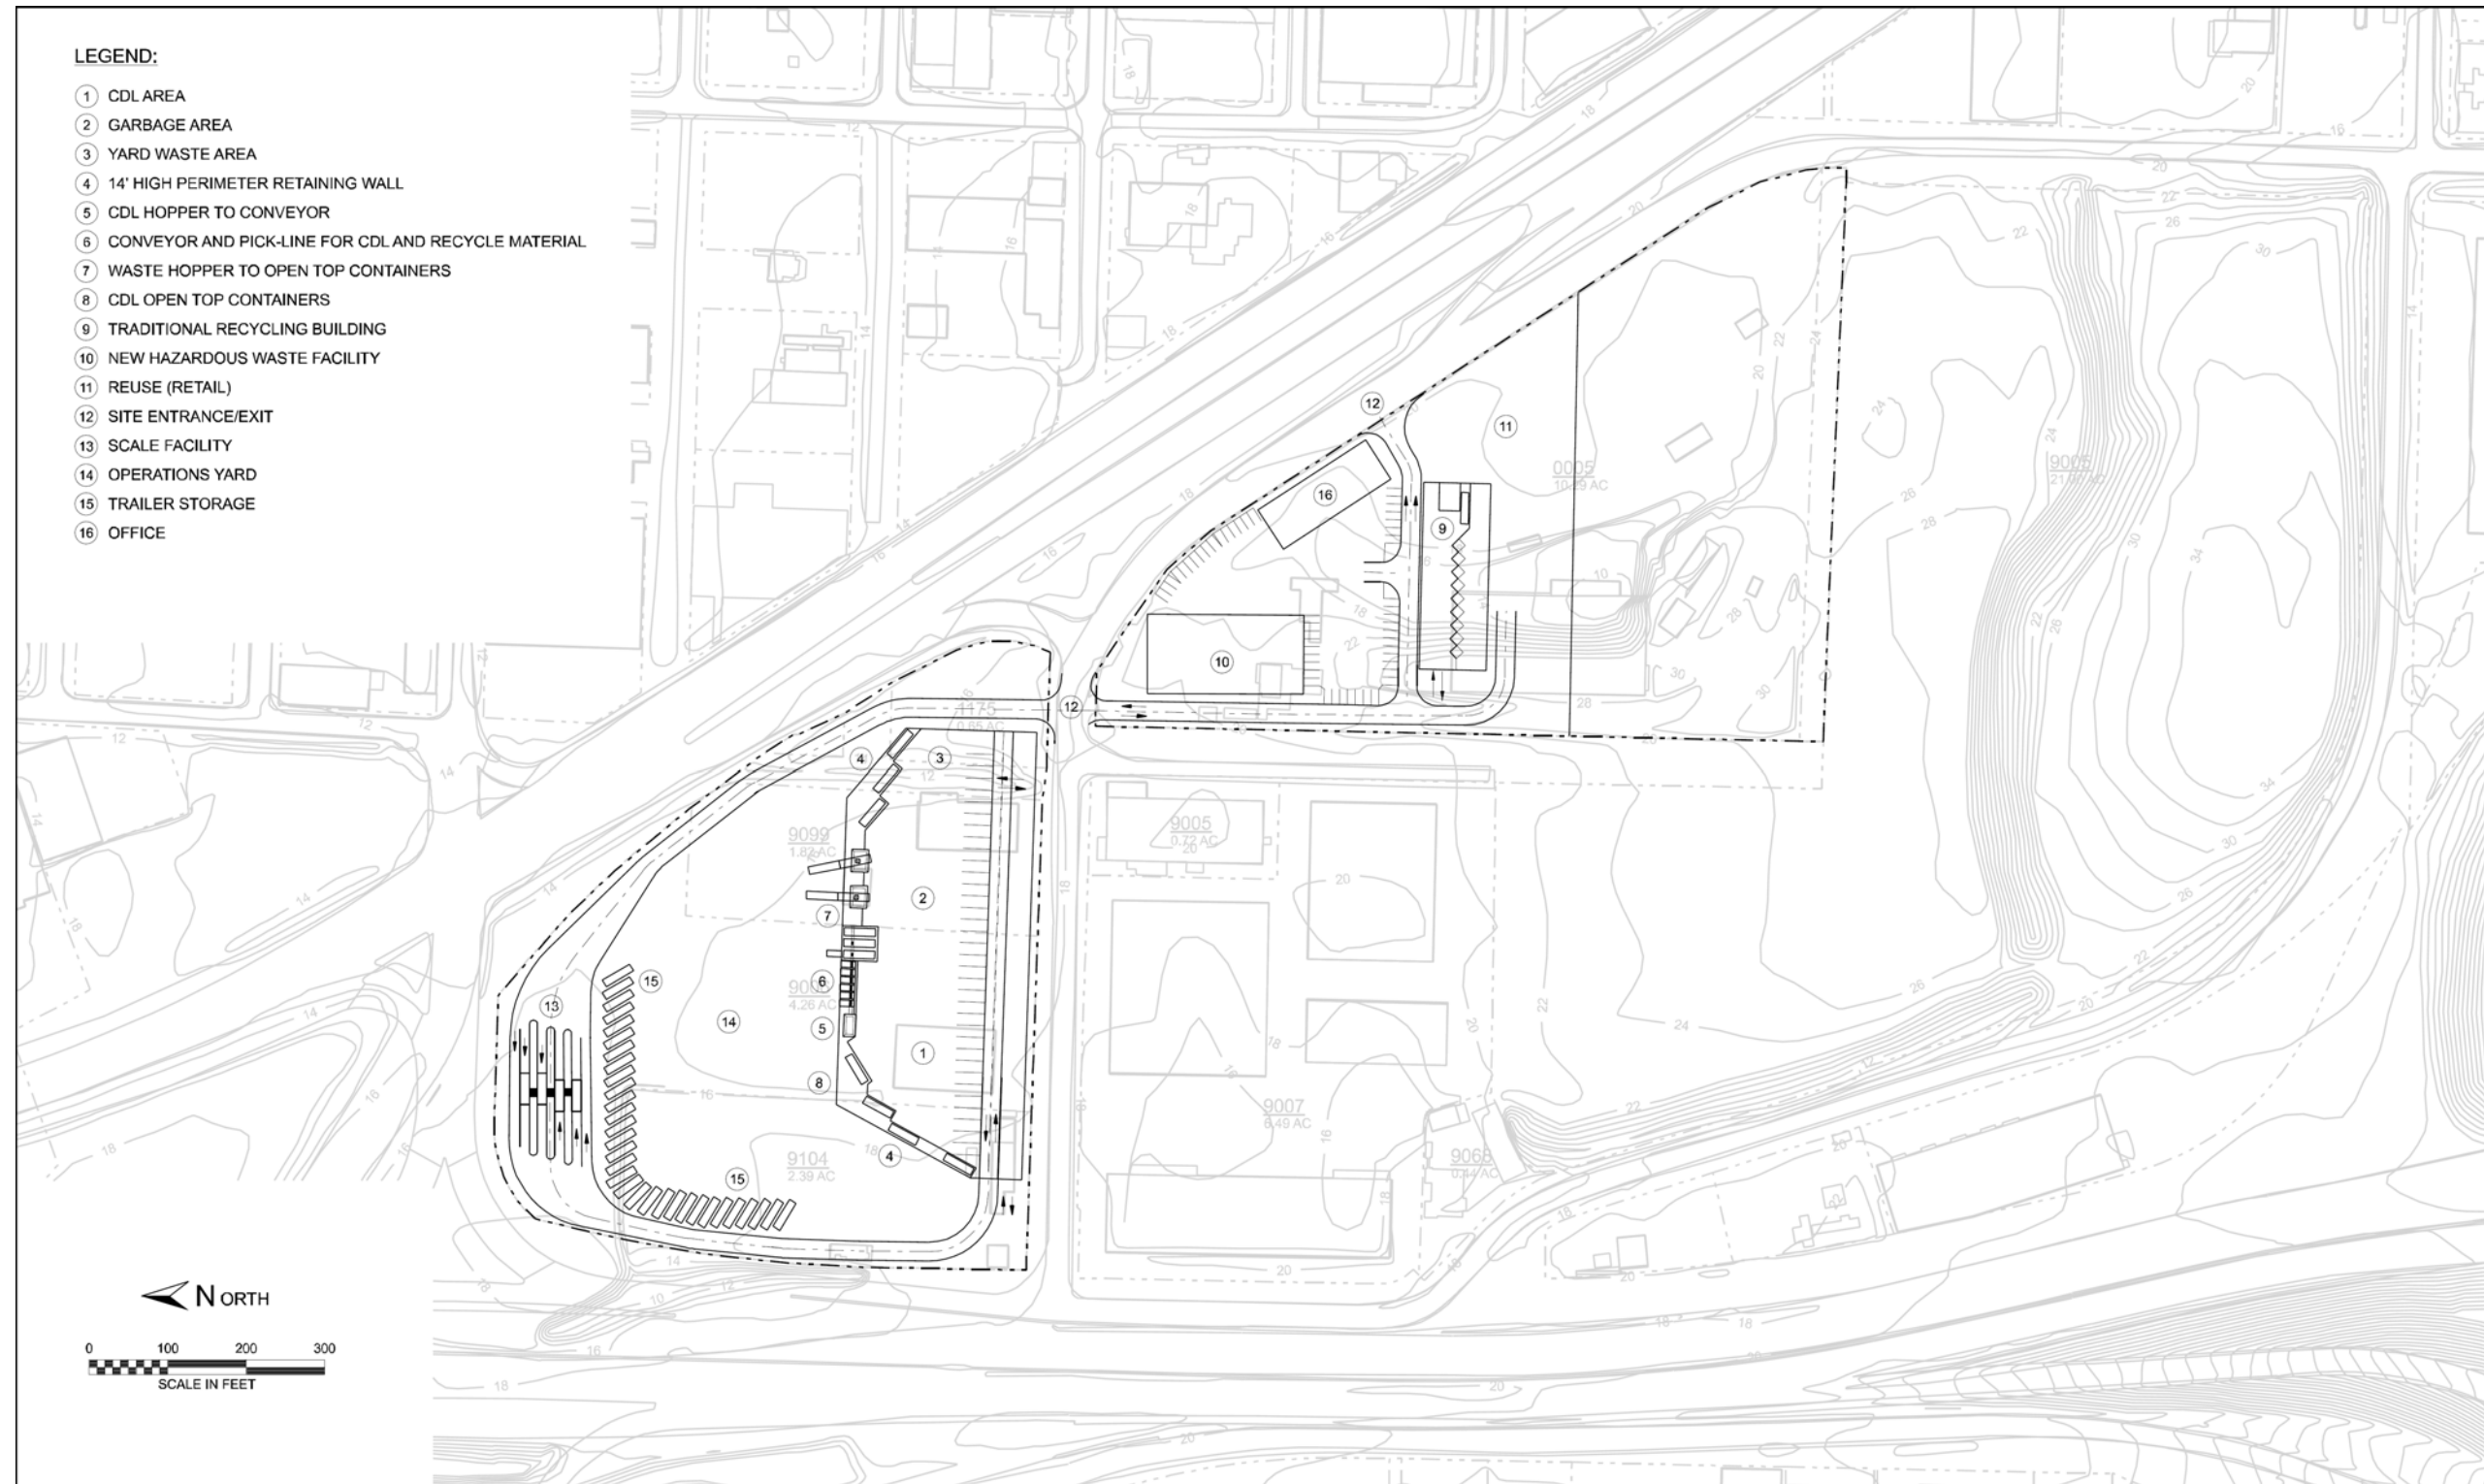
South Recycling and Disposal Station Site Plan Option 18.1
